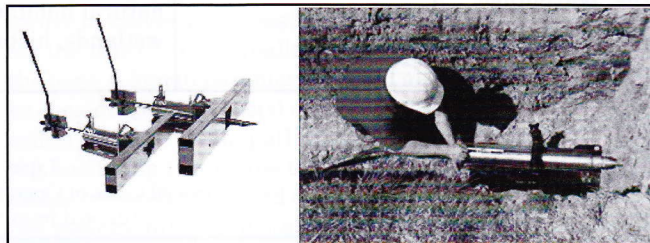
Examples of rod-pushing tools on left and impact tool on right. The upper rod-pushing tools also rotates, so it can be considered to be a rotary rod tool. Photos courtesy of Charles Machine Works, Inc. (Ditch Witch)
